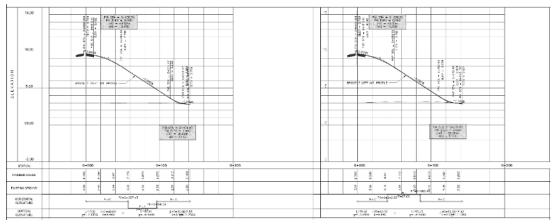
Layout Profile of West Diversion Road Access Ramp to/from Existing Road
